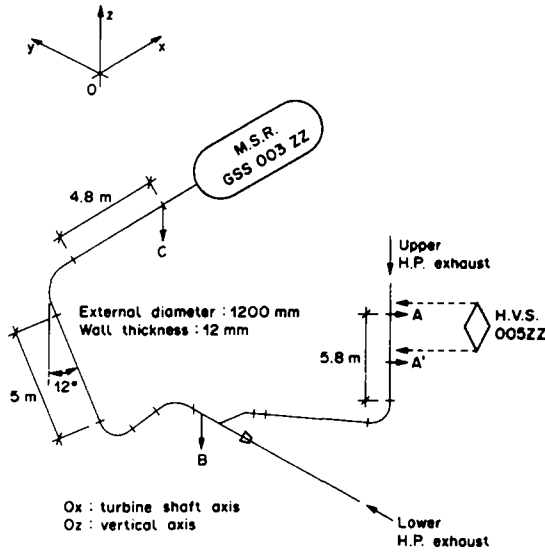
Isometric drawing of the Bugey power plant GSS 003 ZZ M.S.R. supply.
